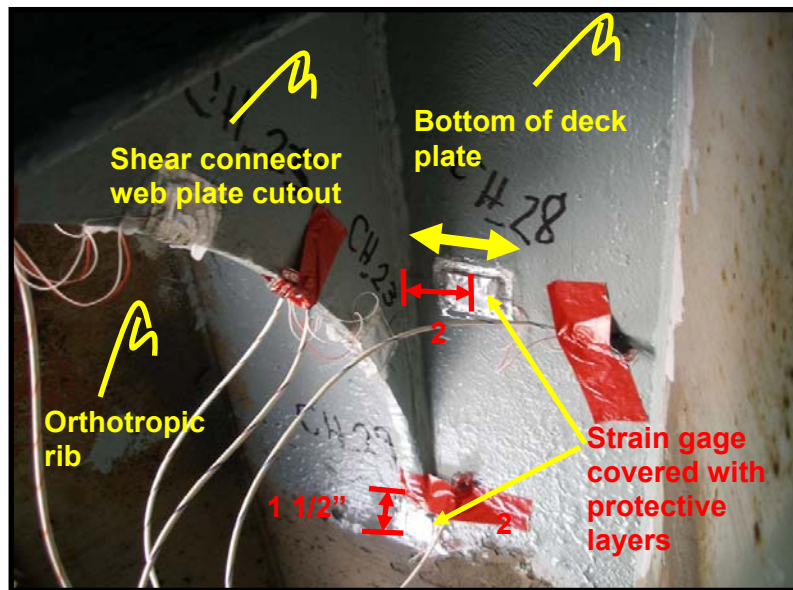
Strain gage CH_28 installed transversely on the bottom face of the deck plate at 2 in off-center from the shear connector web near the south end of the north shear over the east girder and strain gage CH_29 installed longitudinally on the bottom face of the deck plate at 1 1/2 in from the termination of the shear connector weld (view from the bottom up)
